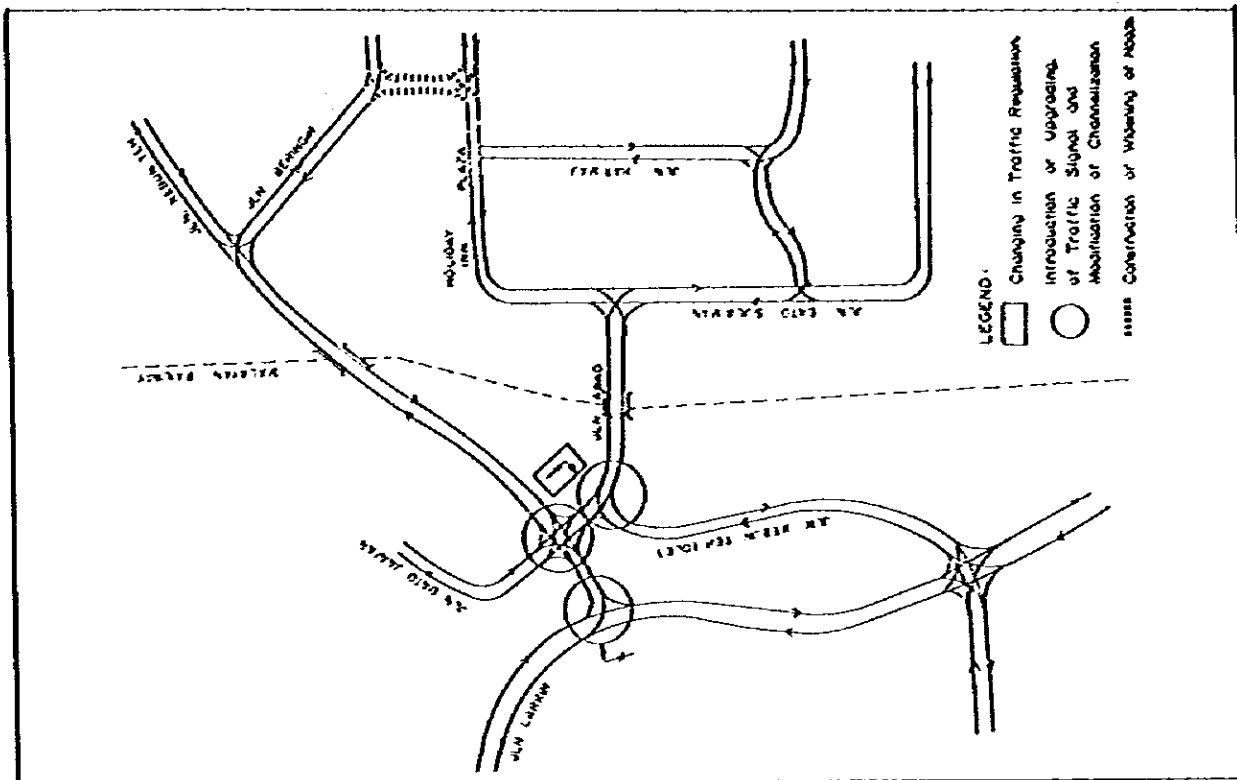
PROPOSED CIRCULATION PLAN (SHORT TERM PLAN)
